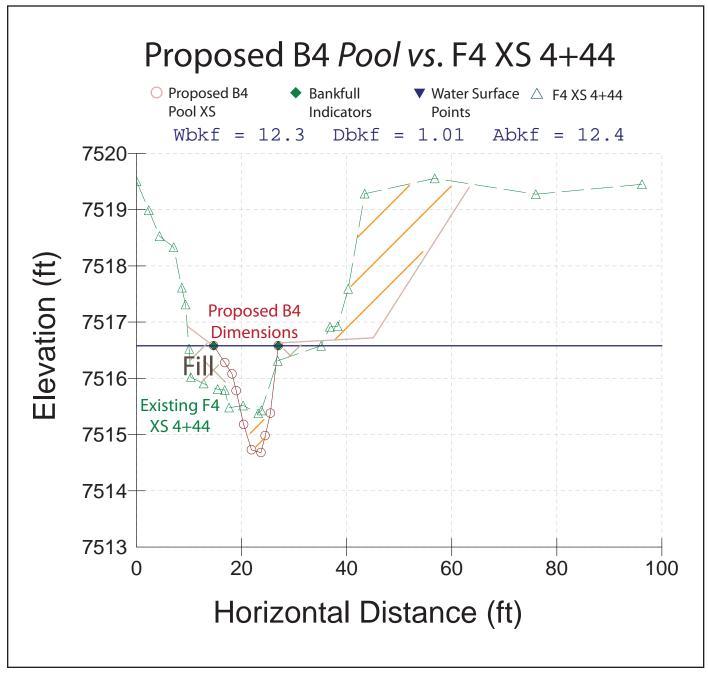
The proposed B4 *pool* cross-section compared to the existing F4 cross-section 4+44, indicating the cut and fill requirements.
